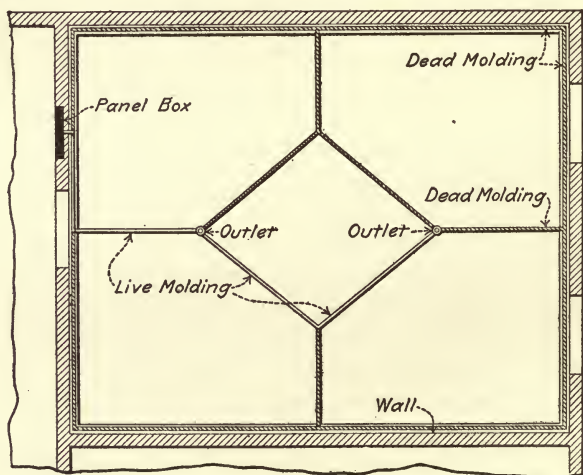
Use of dead molding to insure a symmetrical appearance.
